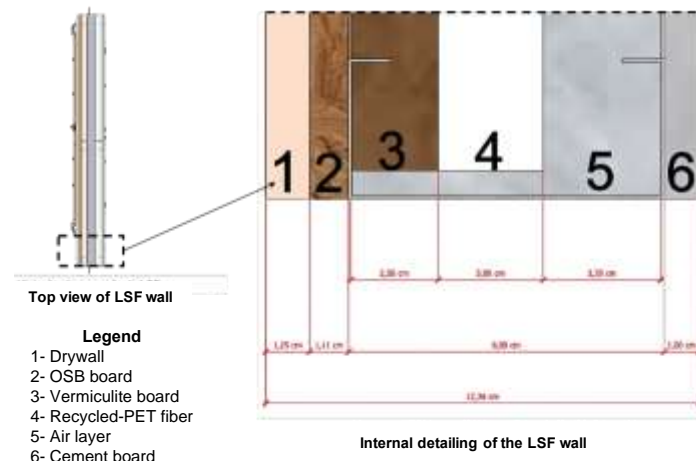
Internal detailing of the test wall (view from above).Source: Prepared by the authors, 2024.
